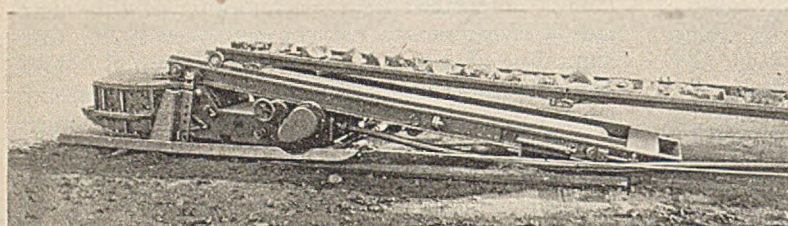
A Belt Conveyor Delivers the Refuse and Is Itself Fed by a Shaking Conveyor Which, Mounted on the Belt-Conveyor Frame, Adjusts Itself to the Distance to Be Traversed
